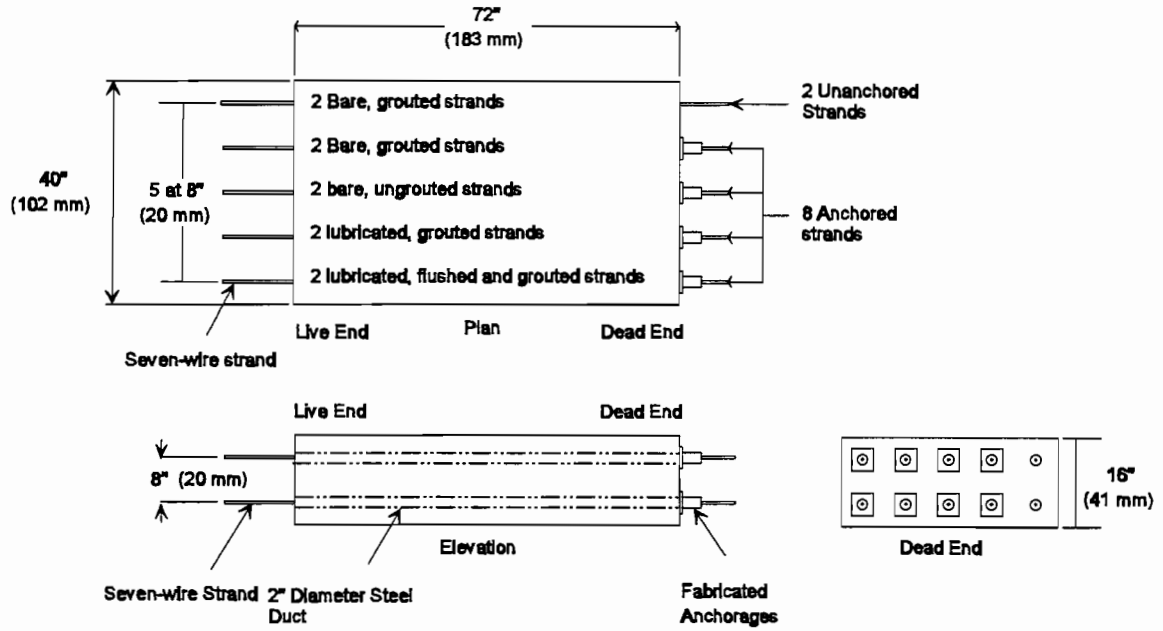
Anchored pull-out specimen used for anchored pull-out tests.
